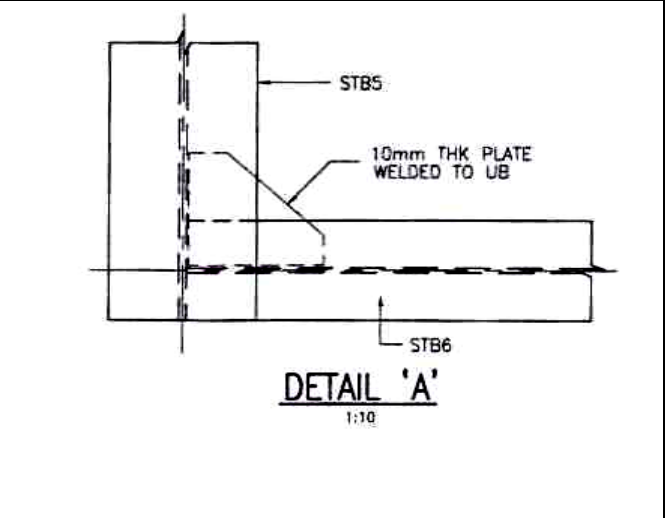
Details for cantilever joint (details and sizes shown are indicative only)
